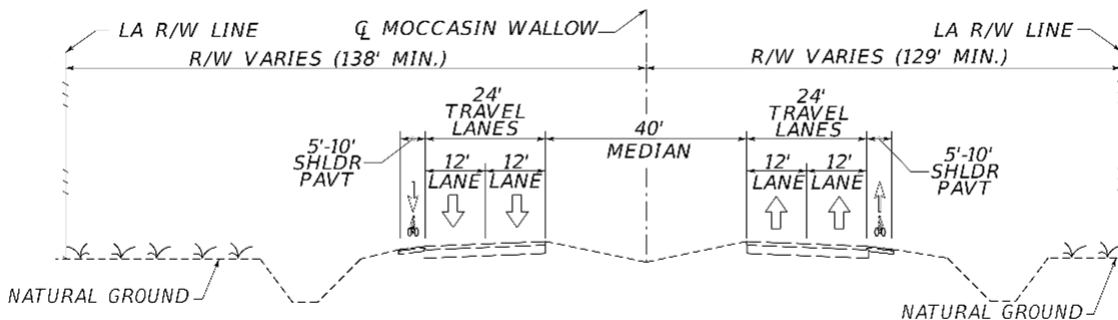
Preferred Alternative Moccasin Wallow Road Typical Section
